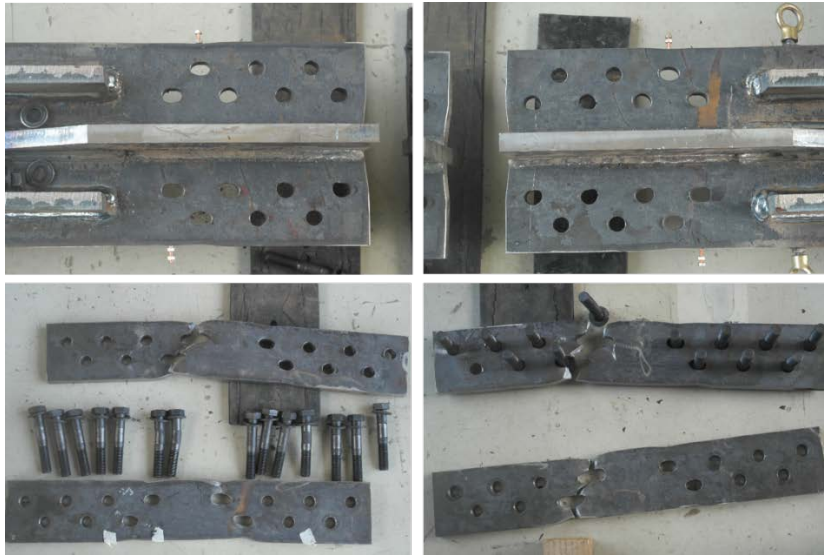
Net Section Failure of Specimen T25-490-7-40
